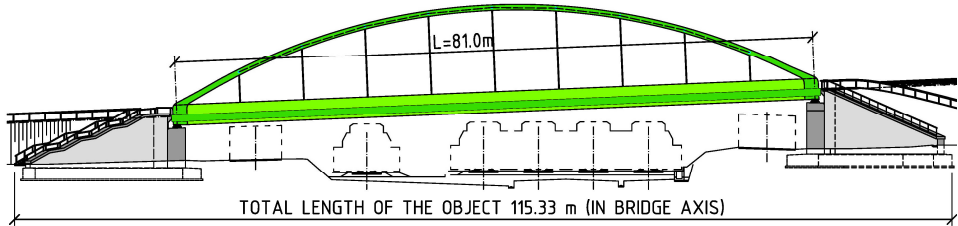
Longitudinal view of the road bridge in Liptovský Hrádok City.
